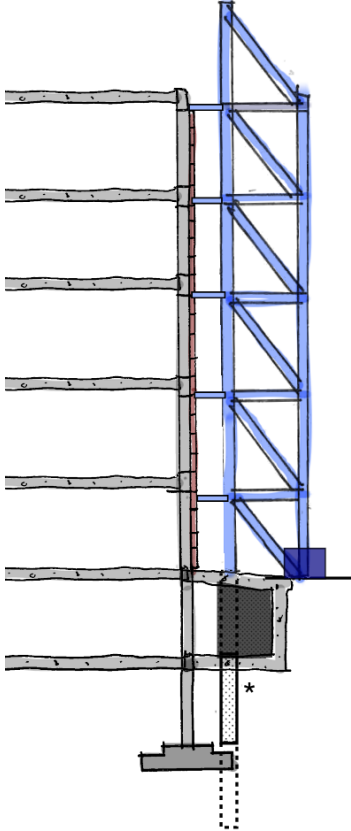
Envisaged 71-81 Whitfield Street façade support arrangement
